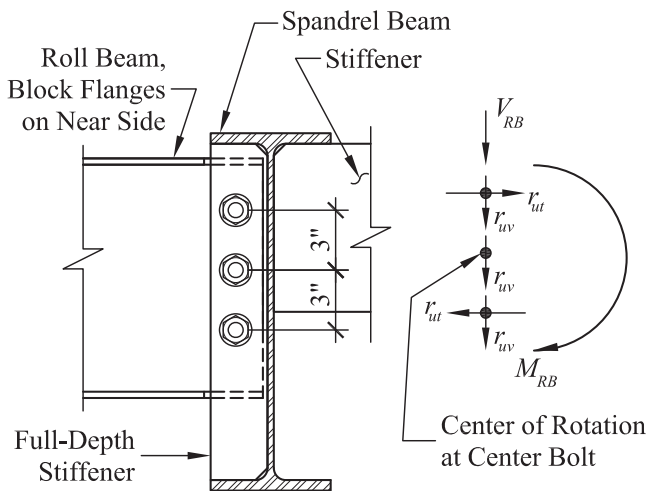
Forces on bolts at roll beam to spandrel beam connection.
